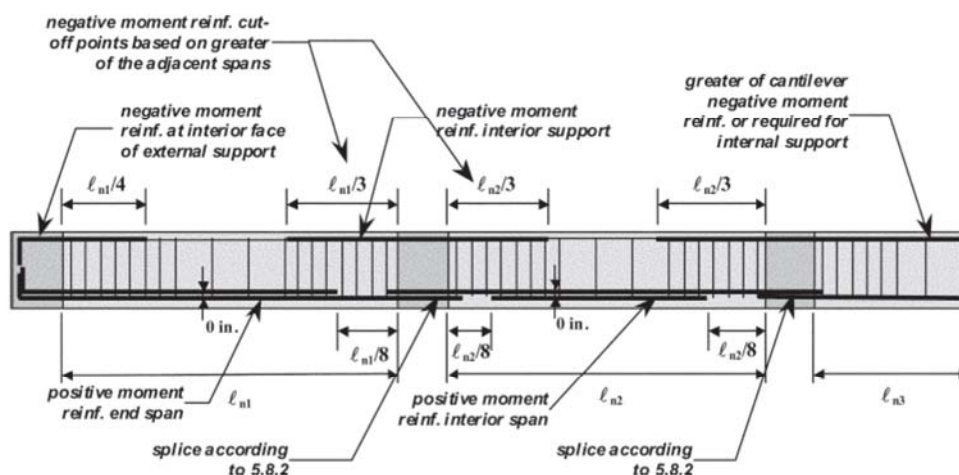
Reinforcement for beams and joists supported by beams or girders.
